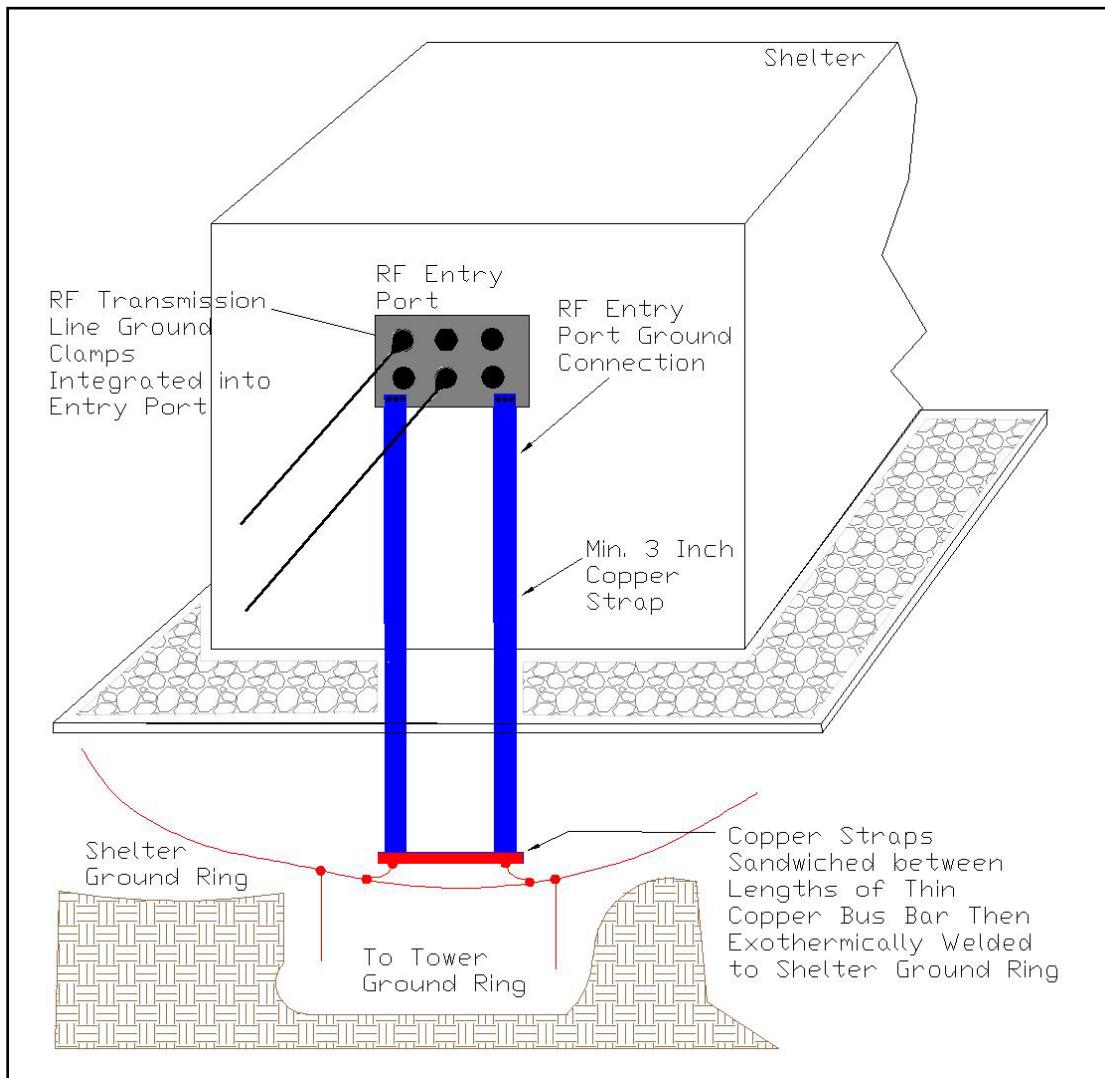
RF Entry Port Installation Detail – Options 4 – 6
